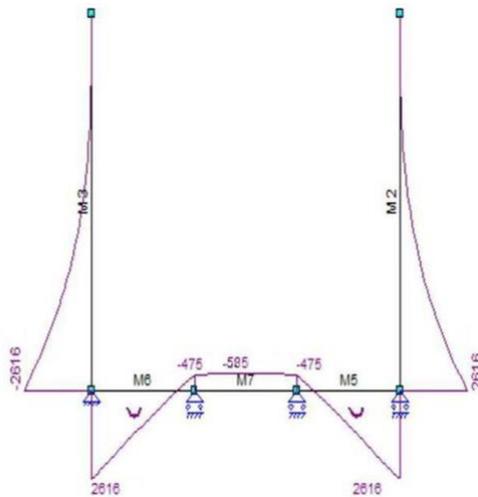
Forces on a fixed supported dry dock (Molenaar 2013)
